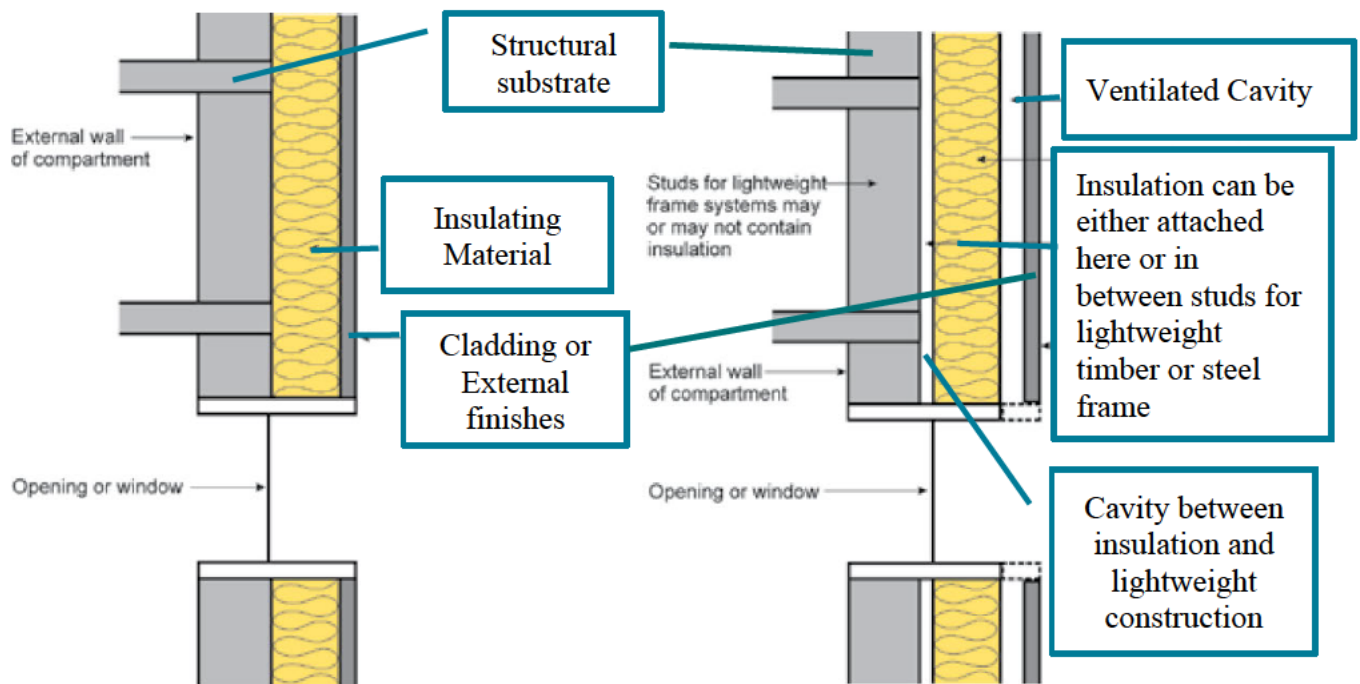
Elements of a non-ventilated wall (left) and ventilated cavity wall (right)[1]
